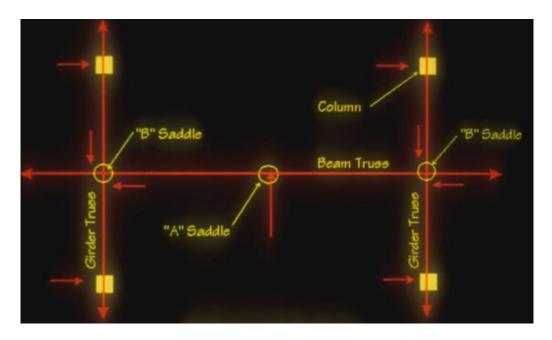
Schematic of Load application of orthogonal trusses (ACI-318, CEU)
